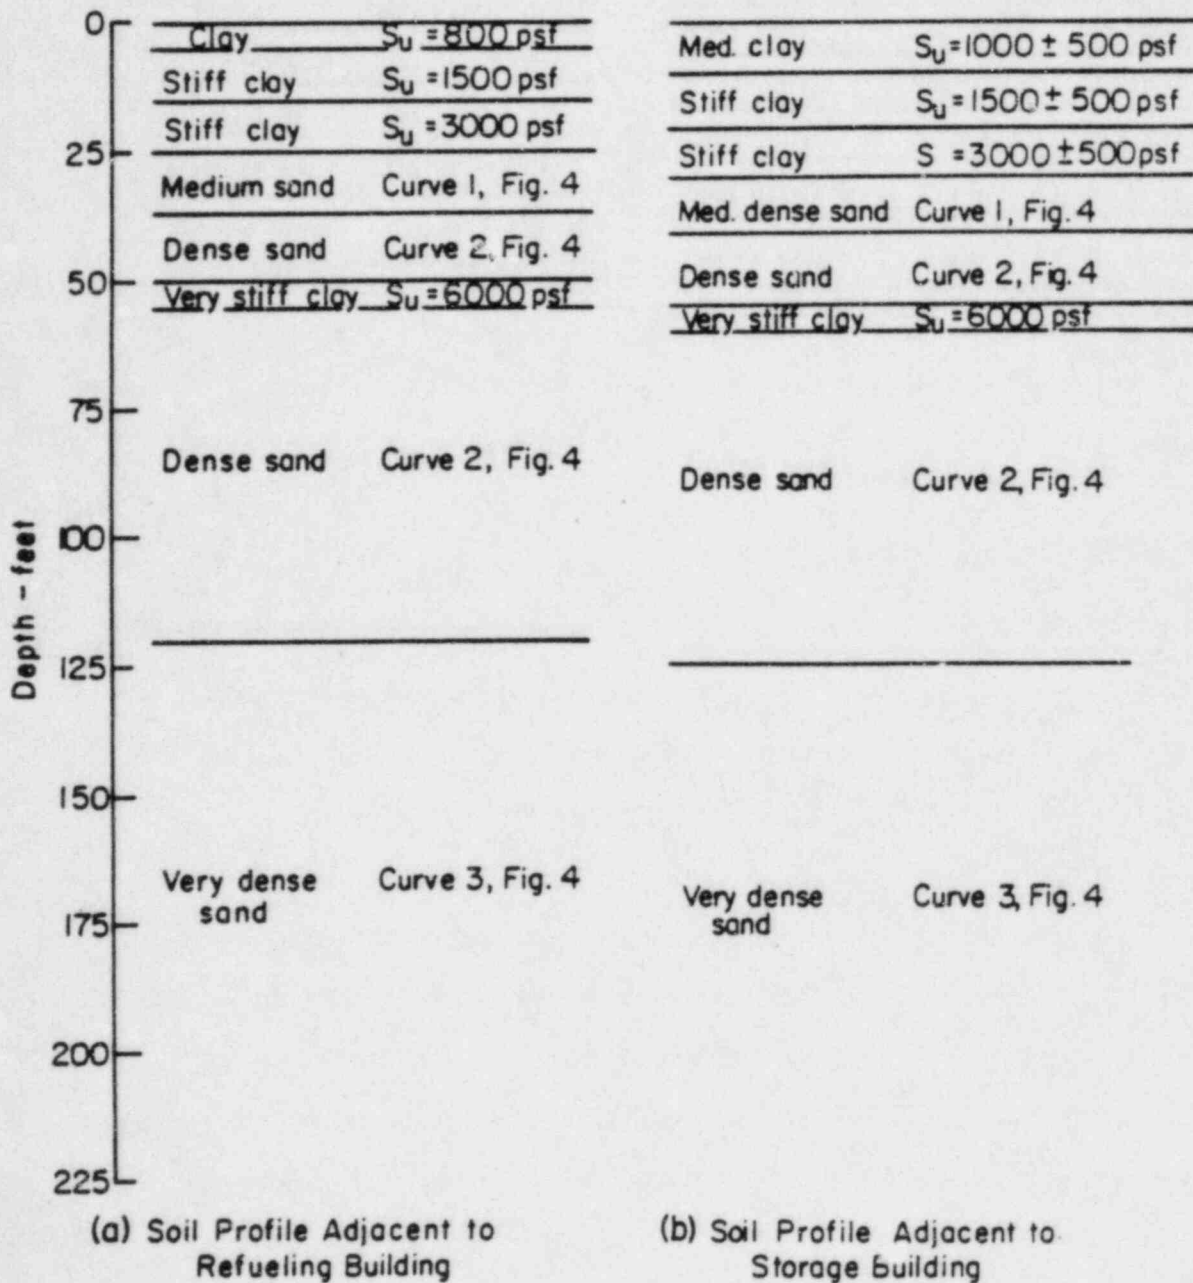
SOIL PROFILES AT HUMBOLDT BAY POWER PLANT SITE
